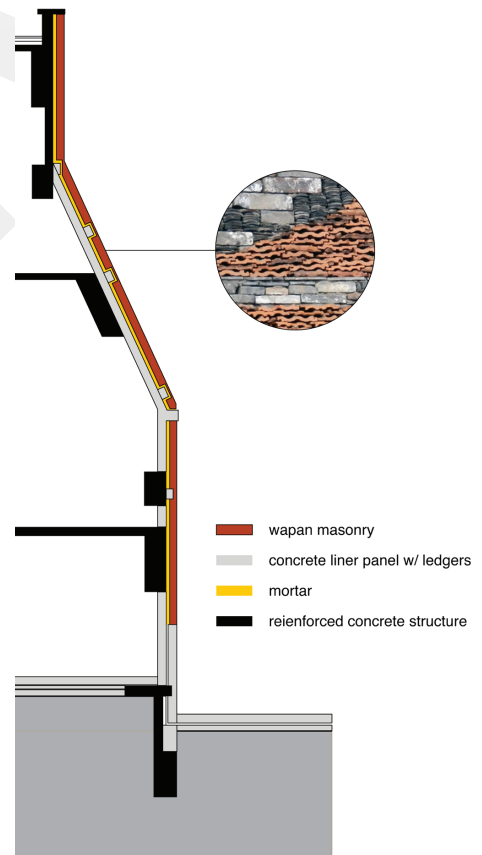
Ningbo Museum wall section Source: Elizabeth Golden, 2012.
